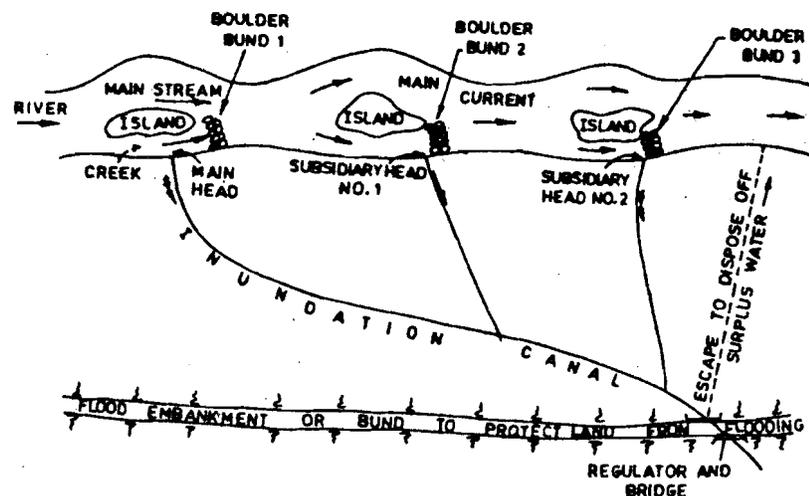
A Typical Layout of an Inundation Canal Headworks
